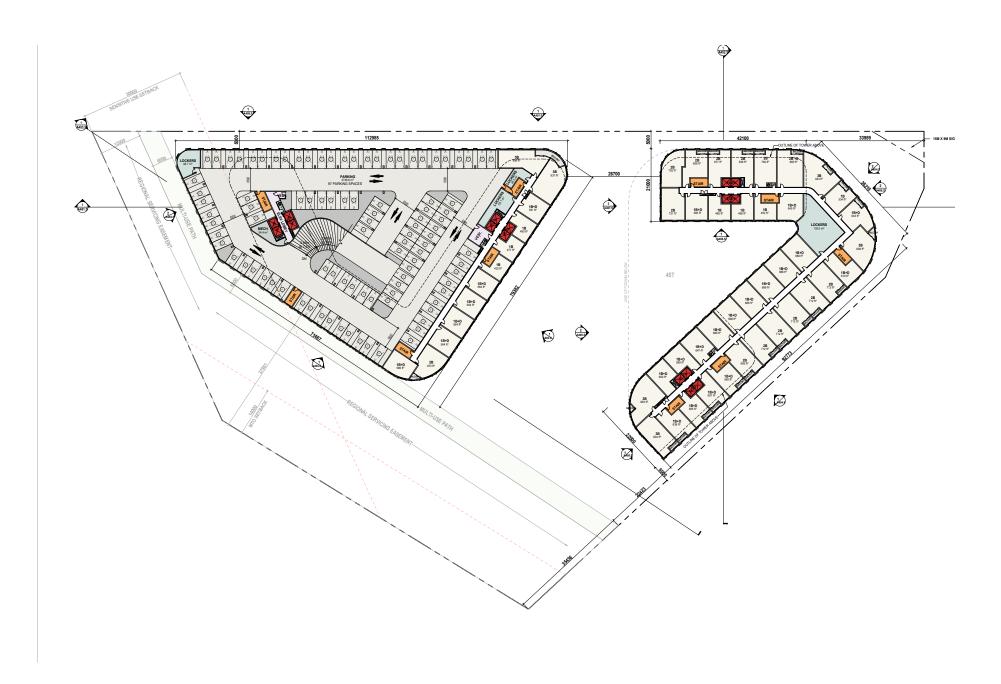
Level 6 Floor Plan (BDP. QUADRANGLE ARCHITECTS LTD.)
